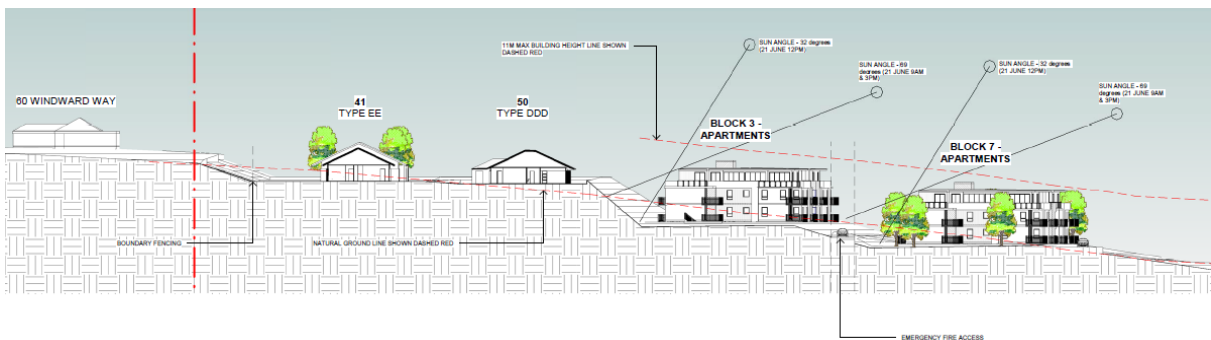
Part Site Section CC showing 11m maximum building height plane (red dashed line)
